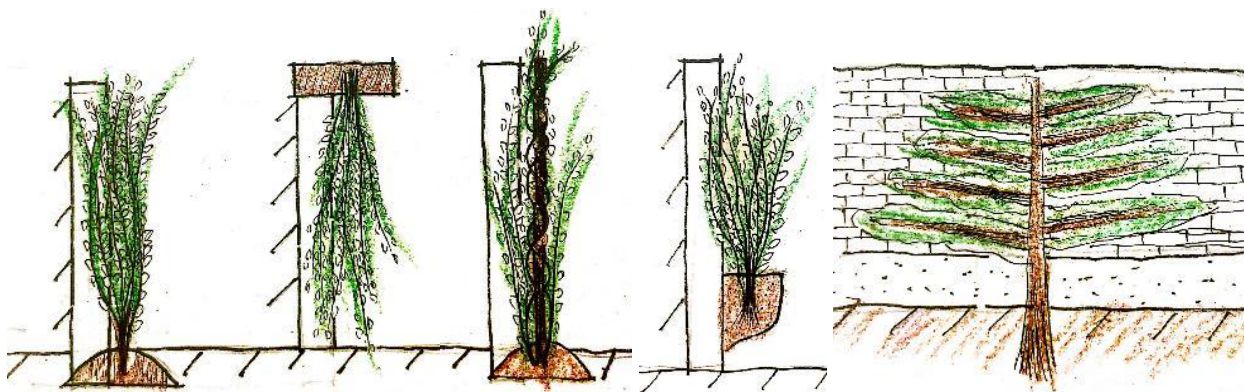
Green façade (from left to right): Ground growing vegetation façade; Cascading vegetation façade; Structural supports integrated façade—steel, cables, mesh or trellis; Structural supports integrated façade—planter box; Espaliering green façade
